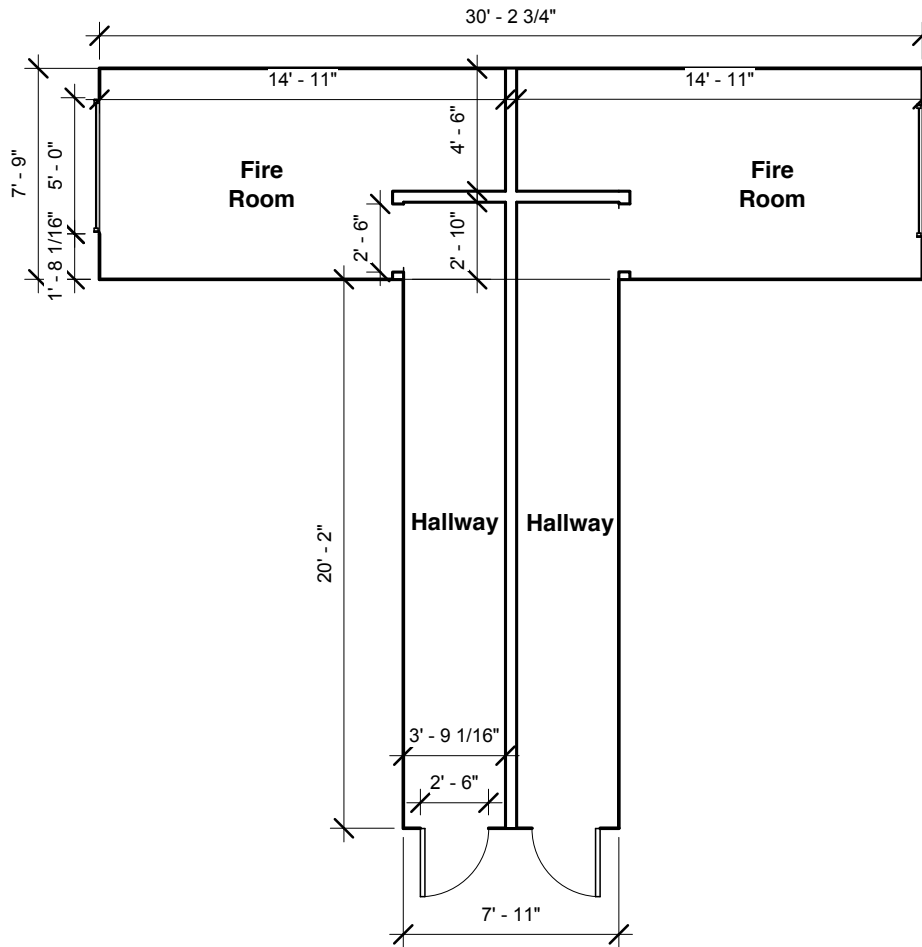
Dimensioned floor plan of the Metal Prop.
